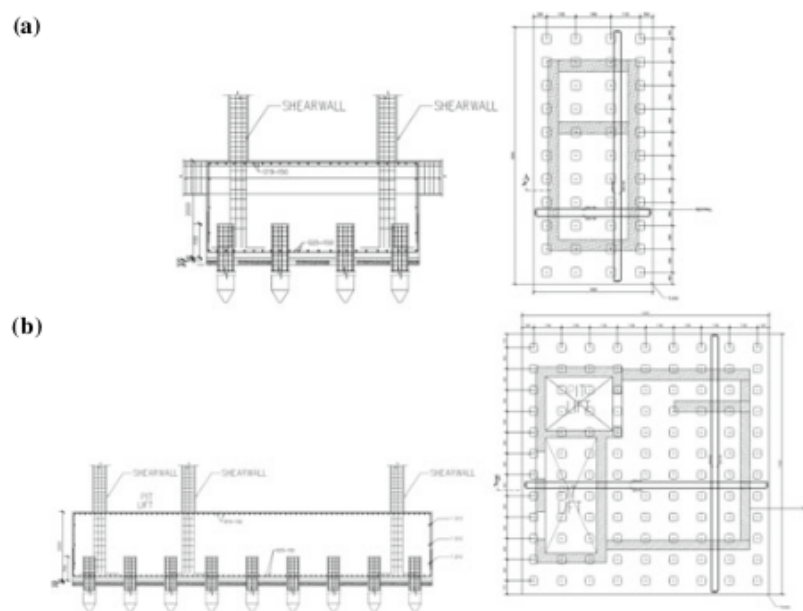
Type of pile cap model a pile cap with 5 element pier 44 piles, b pile cap with 11 element piers with 108 piles
